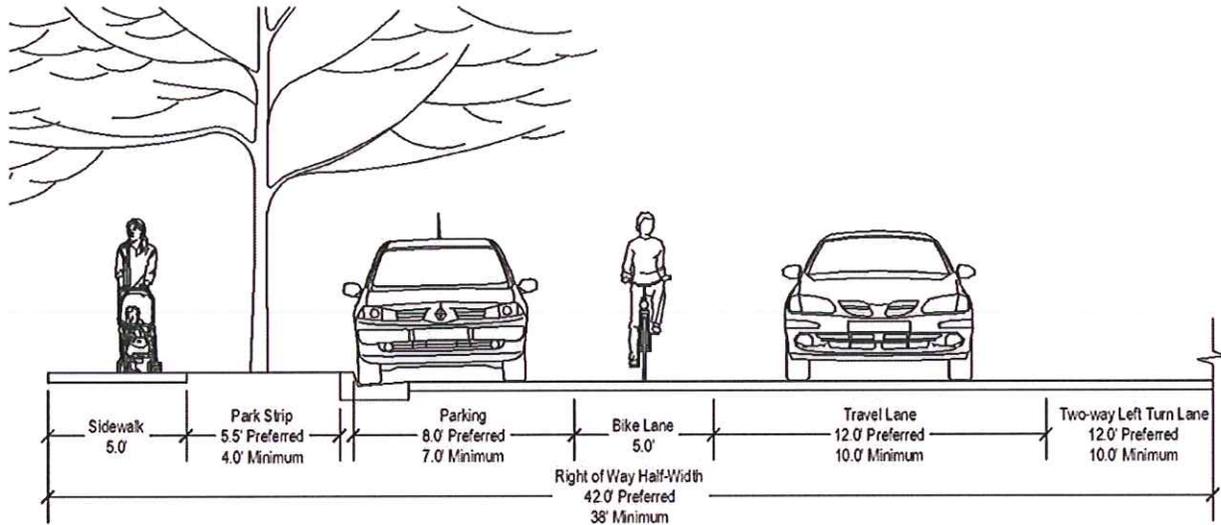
Class 2 Facility - Bike Lanes and Sidewalk
